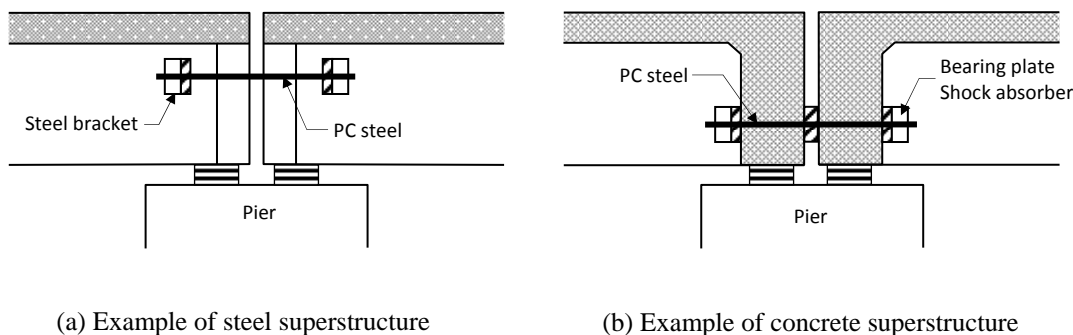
Examples of Unseating Prevention Structures Connecting Two Adjacent Superstructures
